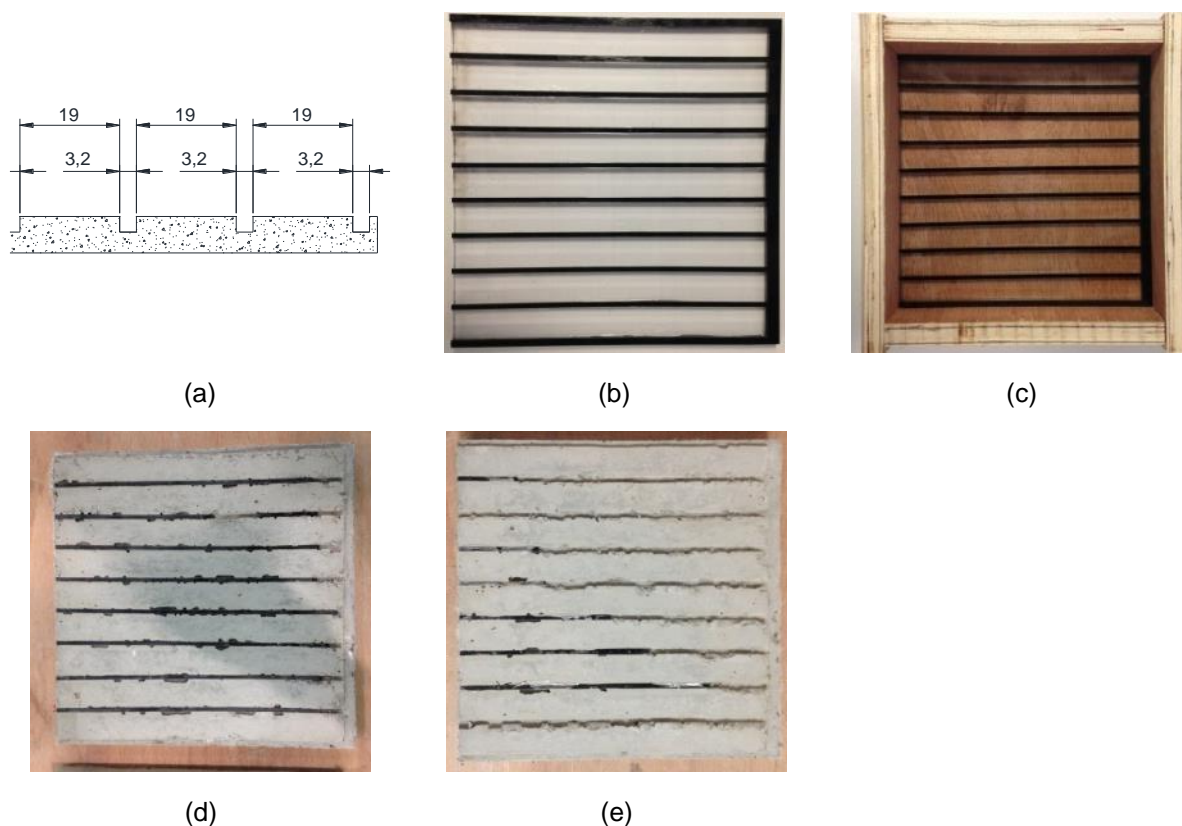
Method 3<sup>rd</sup>: prefabricated grooves with acrylic plate (a) dimension of the design of grooves (b) acrylic grooving plate (c) acrylic grooving plate fits into mold (d) acrylic is stuck on the grooves of the ECC sample (e) broken edges of ECC sample
